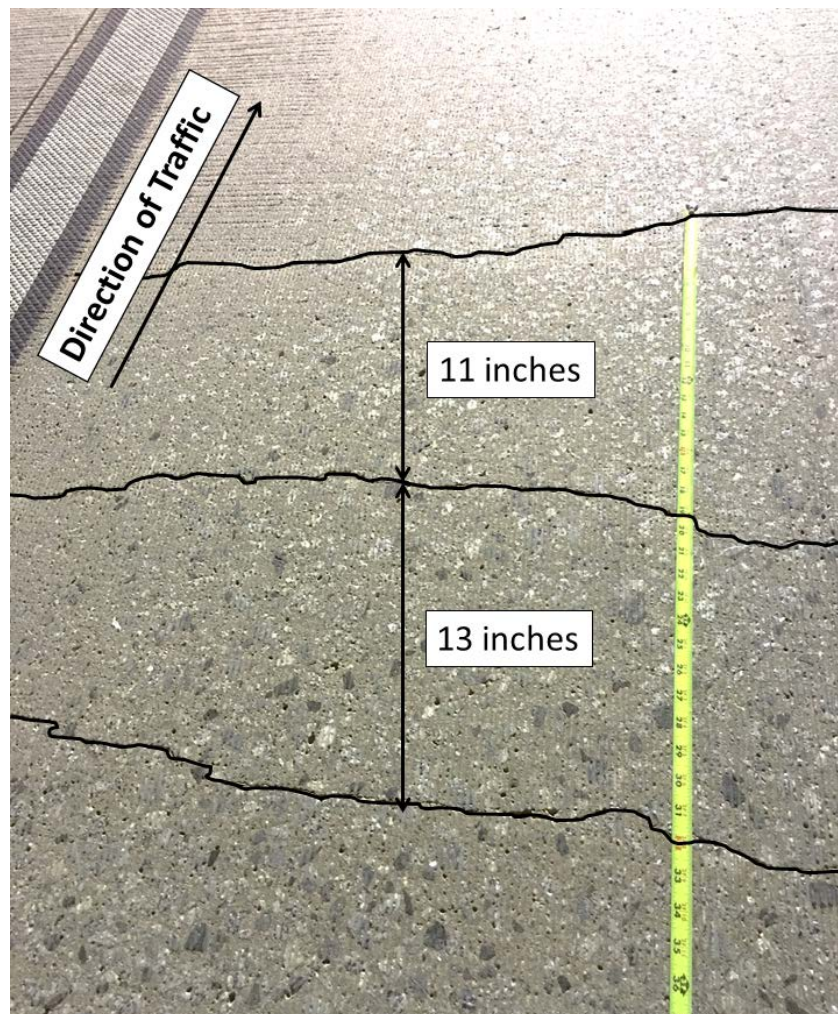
I-85 Typical Transverse Crack Pattern (Cluster Cracking)
